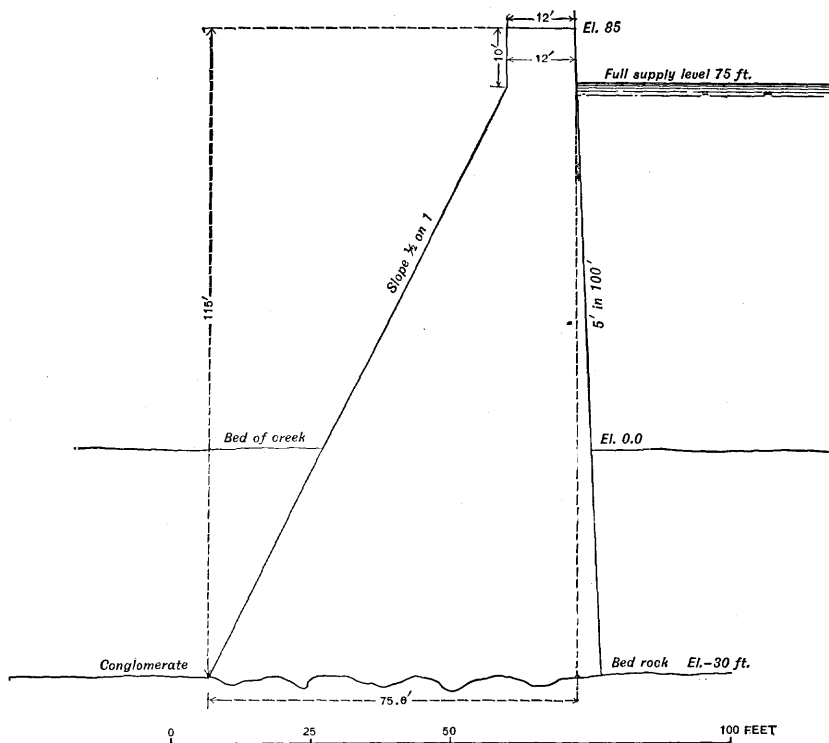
Maximum cross section of concrete dam, East Park dam site.
